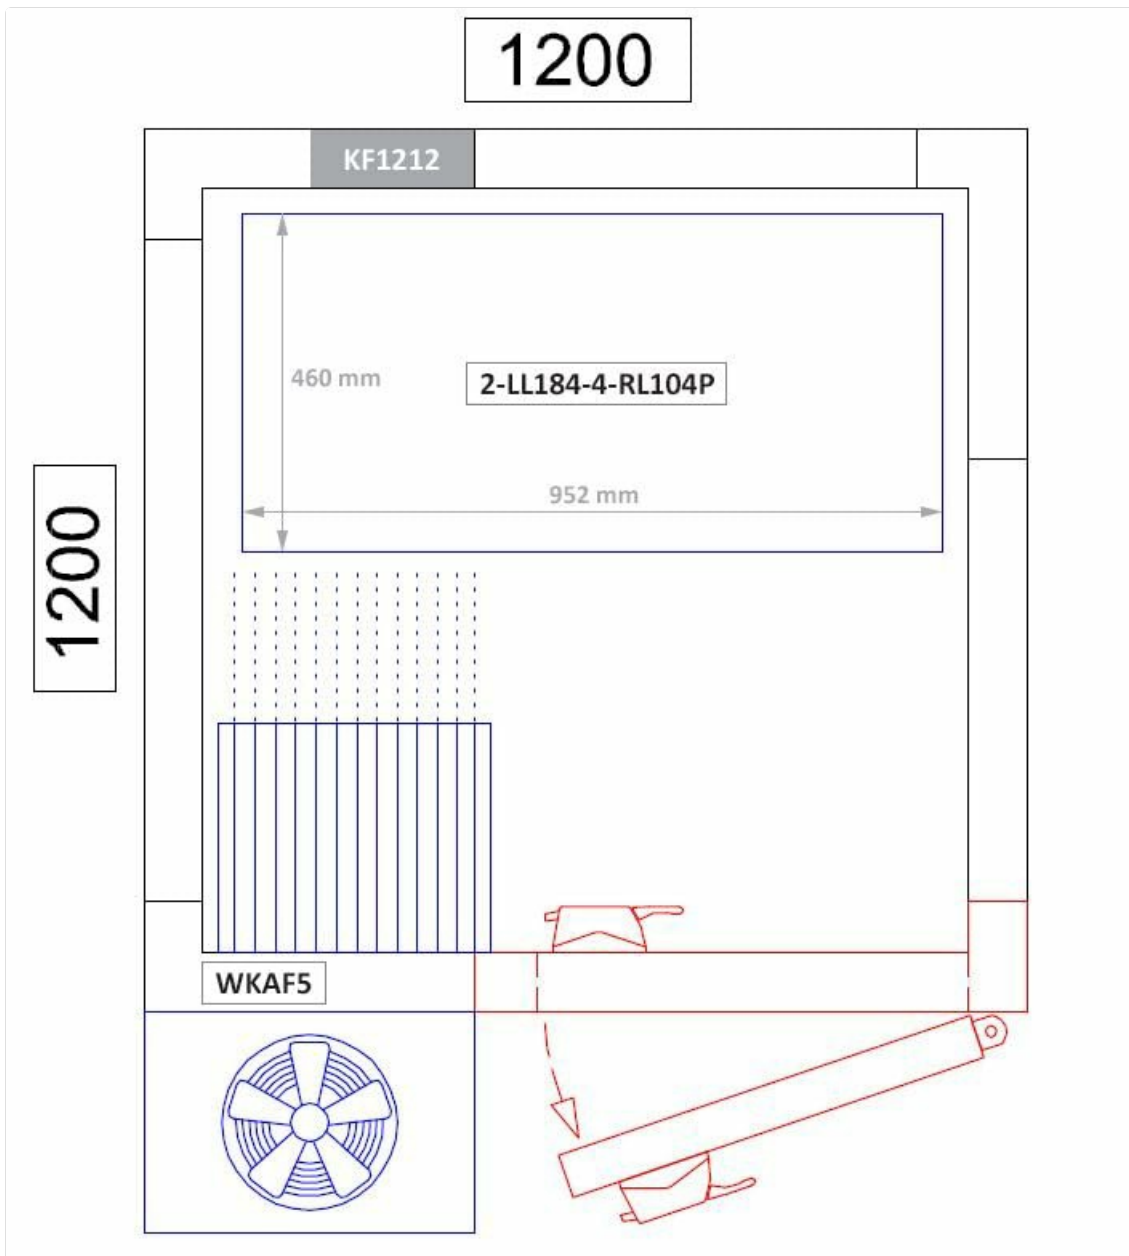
Internal layout diagram, indicating component placement and dimensions.
